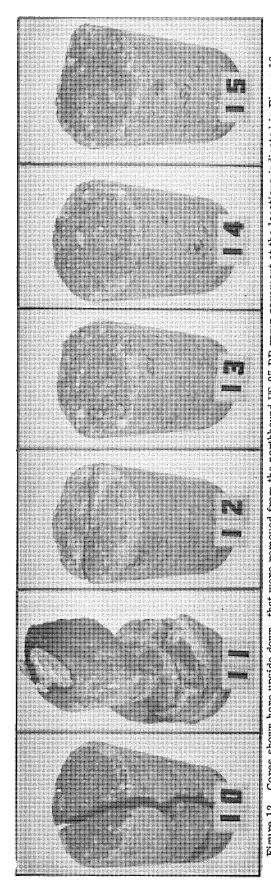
Cores shown here upside down, that were removed from the northbound US 27 BR ramp pavement at the locations indicated in Figure 10. The pavement was built and opened to traffic in the spring of 1961, with 99-ft slab length, poured joint sealants, and base plates under the joints. Pavement age was 18-1/2 years when cored.
